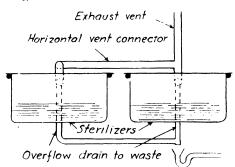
Vents or steam exhaust connections from sterilizers mounted side by side should never be combined by horizontal piping as shown by this diagram. Connected as shown the exhaust steam from one sterilizer will discharge into the other sterilizer most objectionably. The proper method of interconnecting vent lines is shown by figure 95.
